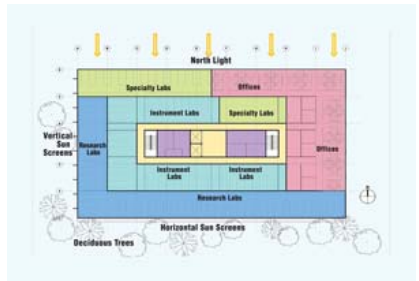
Landscape design should work in tandem with building orientation and glazing to ensure intelligent handling of natural light.
